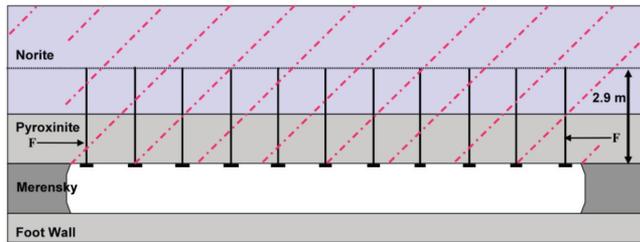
3 m cable anchors with 45° joints in a 20 m panel
